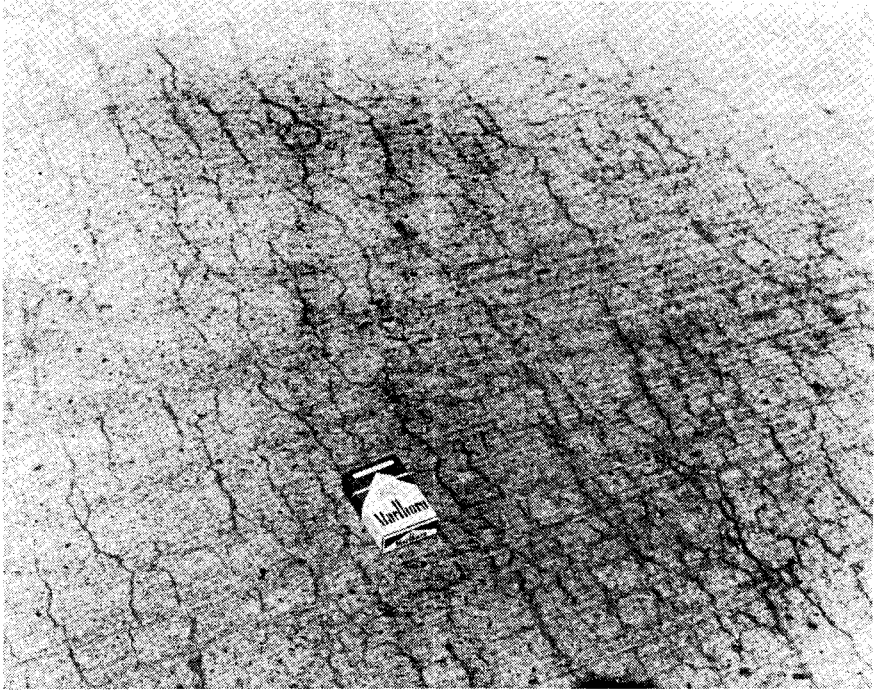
TYPICAL DESTRUCTIVE ALKALI-SILICA REACTION IN PAVEMENT
